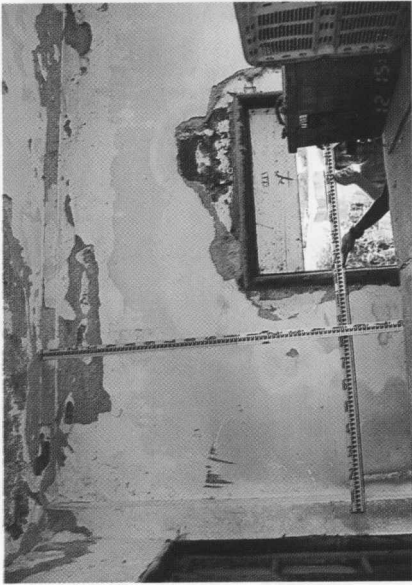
Plaster finished wall and plastered ceiling without leakage for a long year and quoin posts inside in the south side
